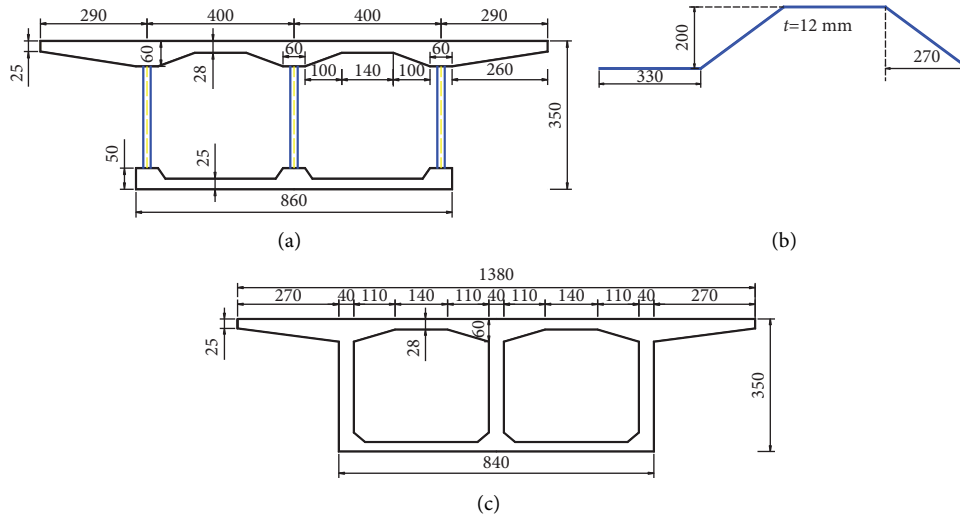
Schematic of the box girder section: (a) section of the composite box girder with corrugated steel webs (cm), (b) detail of the corrugated steel web (mm), and (c) reinforced concrete box girder section (cm).
